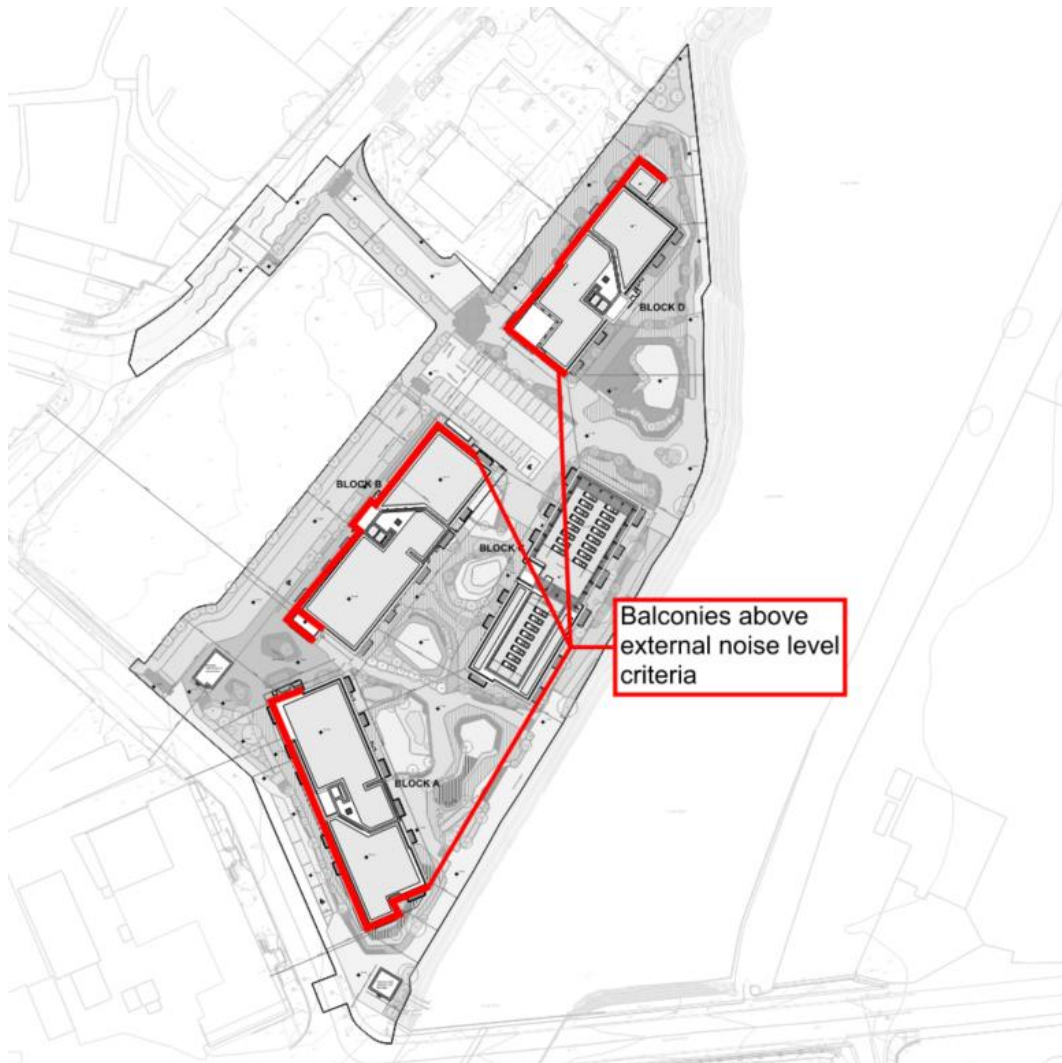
Balconies in Exceedance of External Noise Levels Criteria. (Ref: 24064.P101.4 Site Layout Plan)
